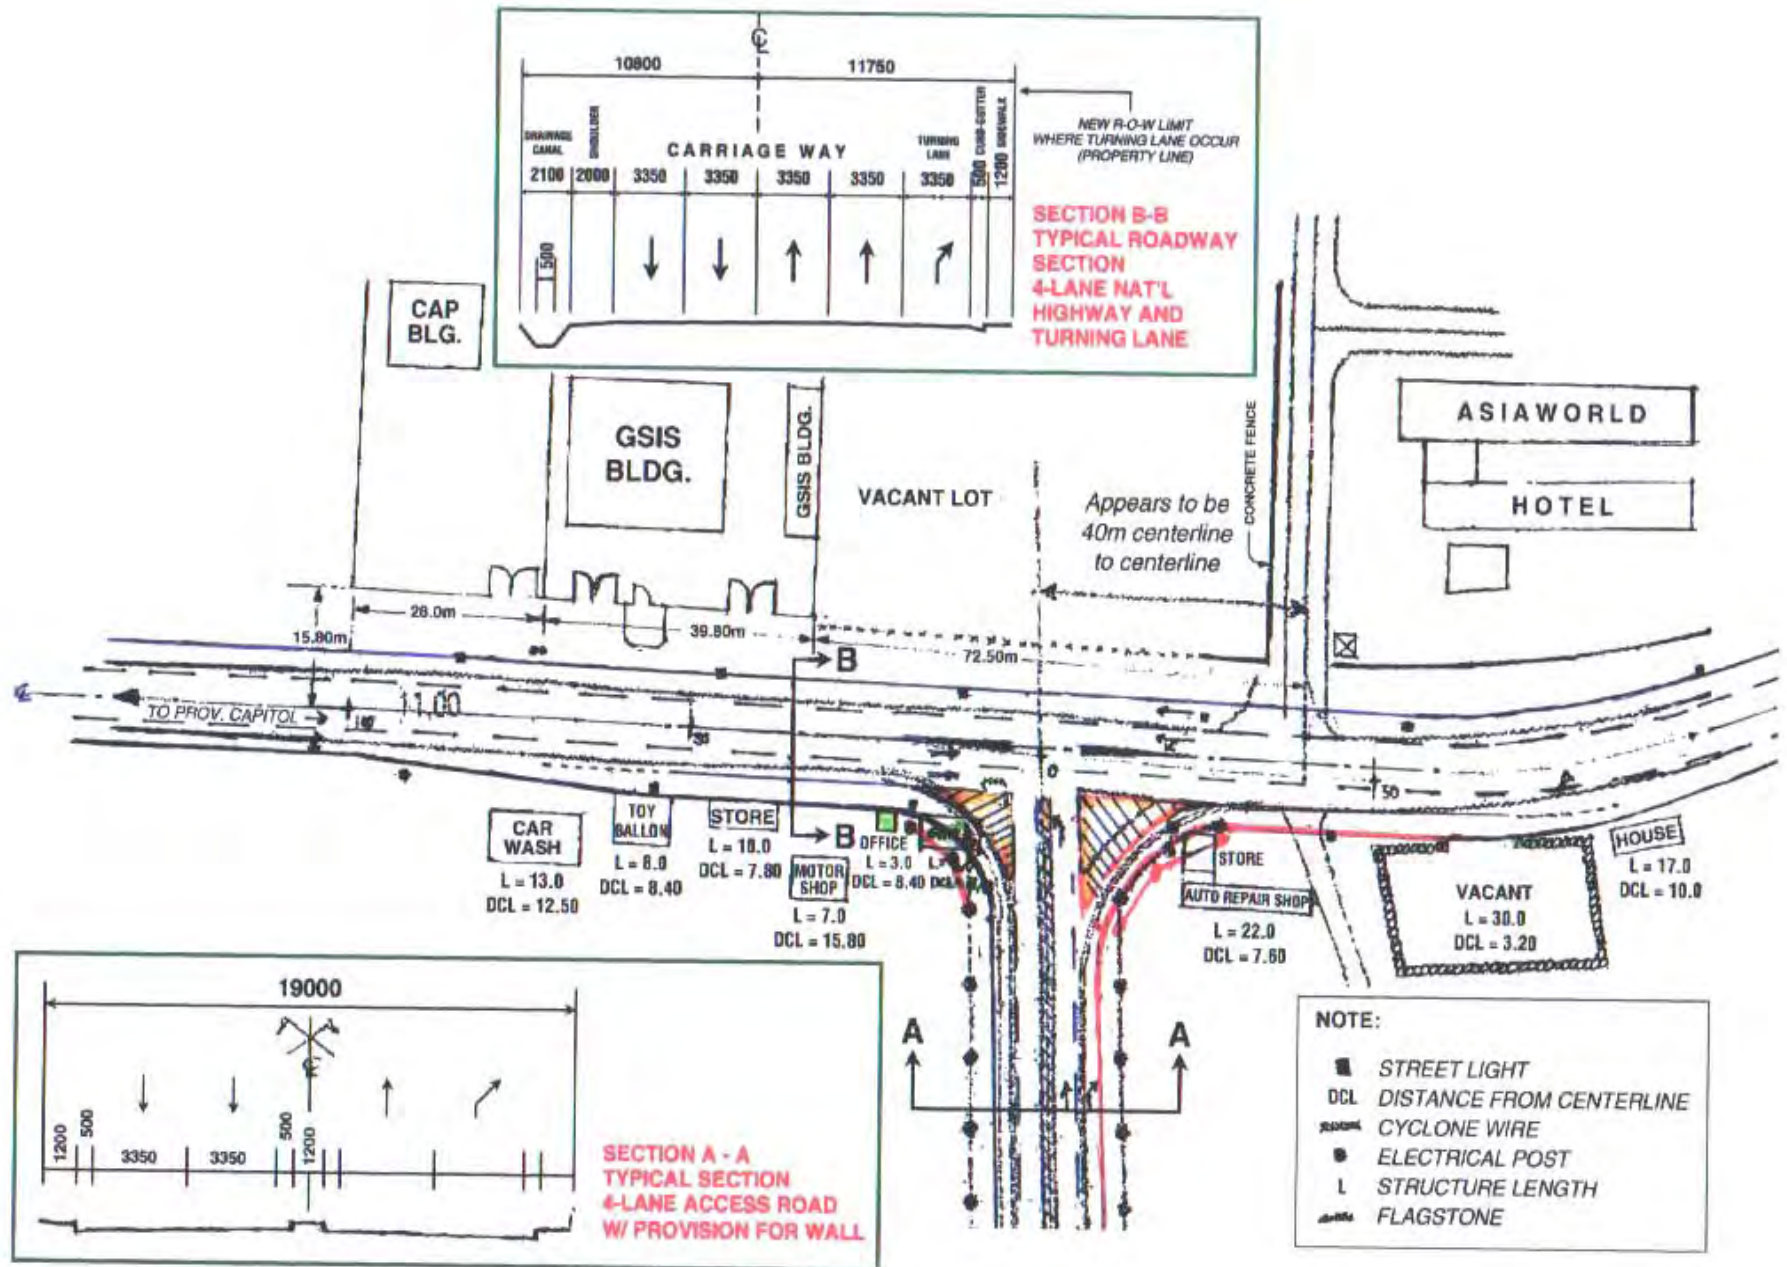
Puerto Princesa Airport Access Road Intersection with Highway
